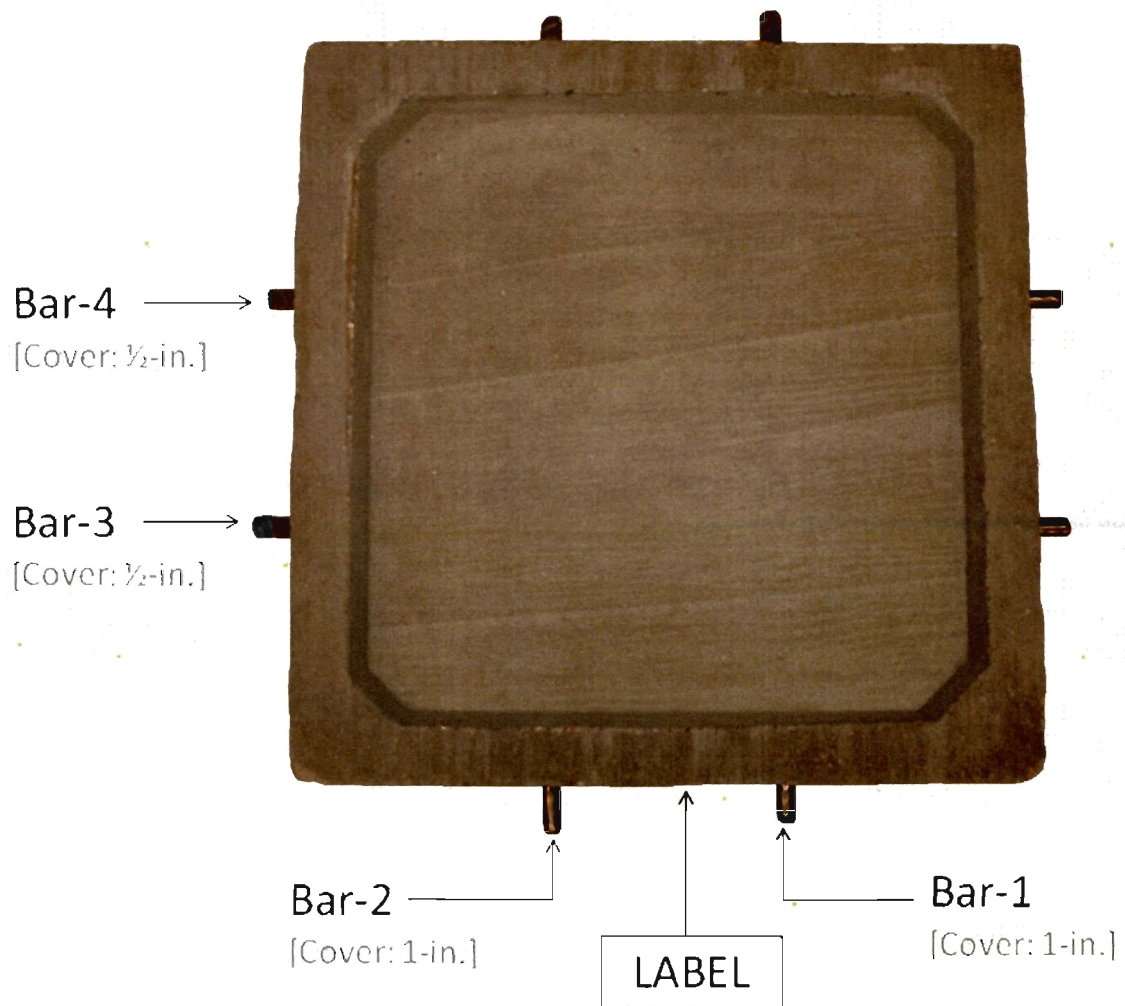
Labeling of bars embedded within a ponding specimen with respect to the specimen's label.
